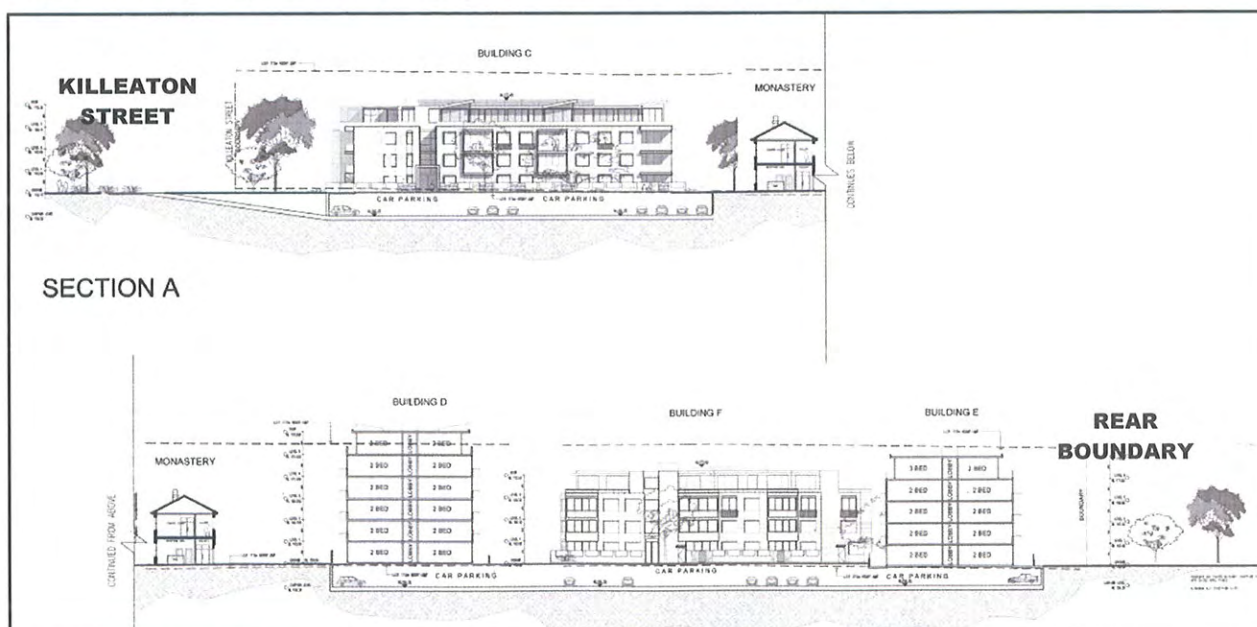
Long Section of site detailing siting and layout of builtform (source: PPR)
